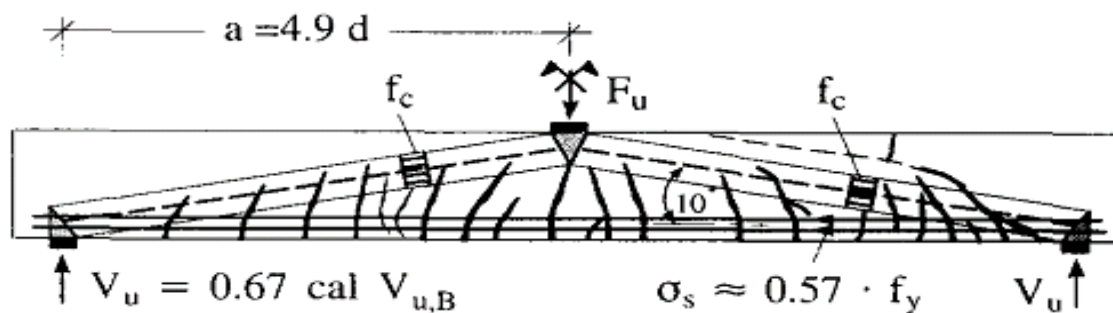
11: Crack Pattern at Shear Failure of Beam with Unsafe Strut-and-Tie Model(Kupfer and Gerstle 1973)
